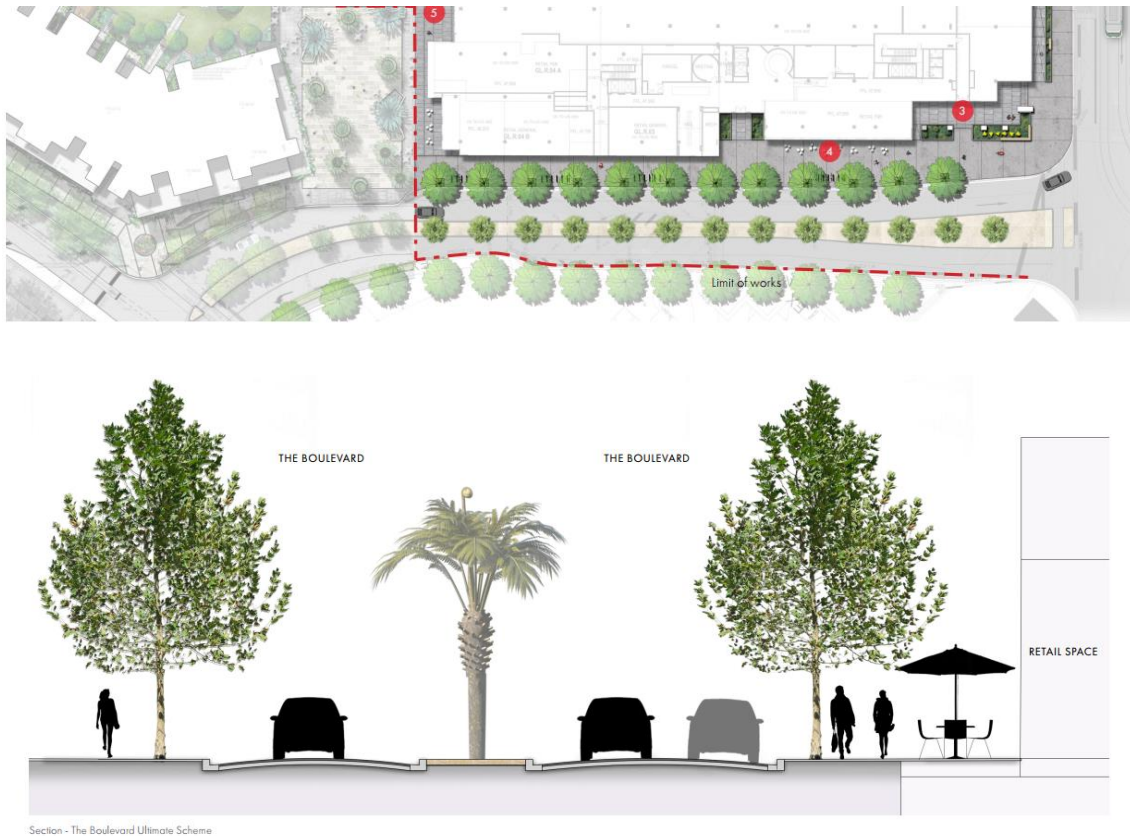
Extract of landscape plan (Appendix K) – Caulfield Boulevard
